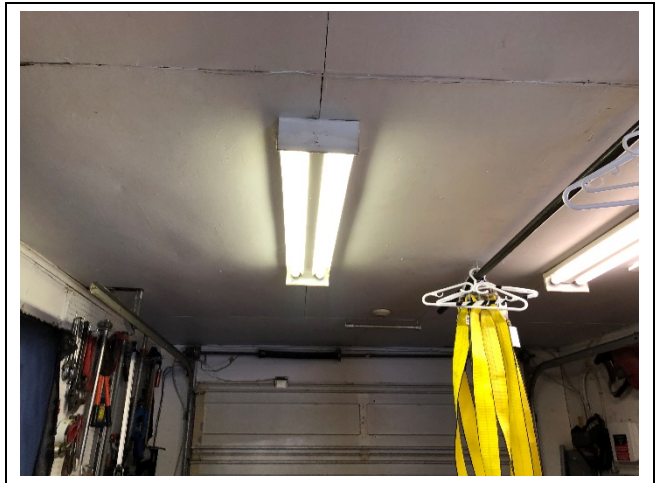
Pier Building – Fluorescent light tubes containing mercury vapour.
